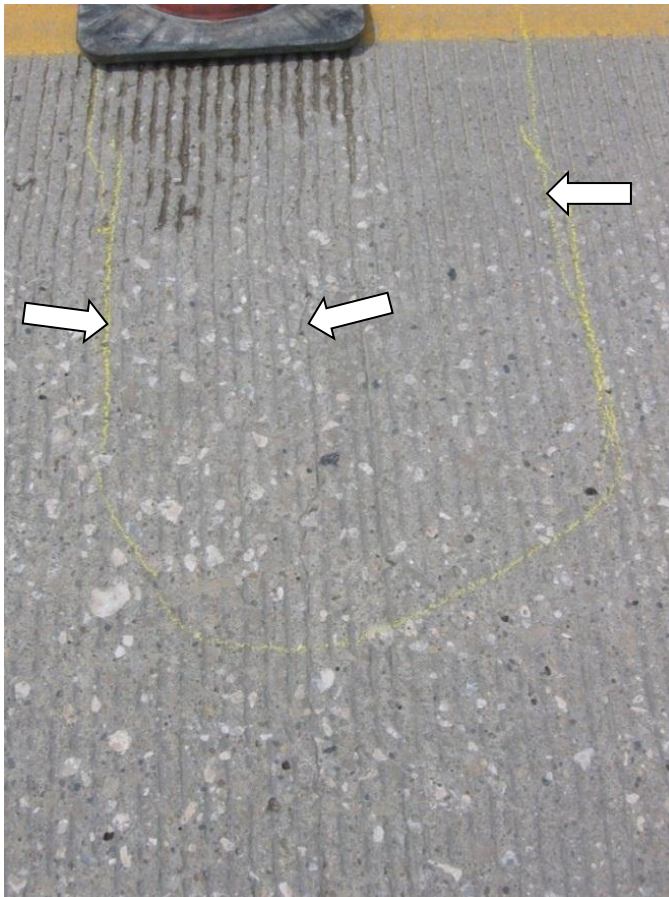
Area of delaminated concrete (outlined in yellow) at a transverse crack in the IA 150 bridge deck.
